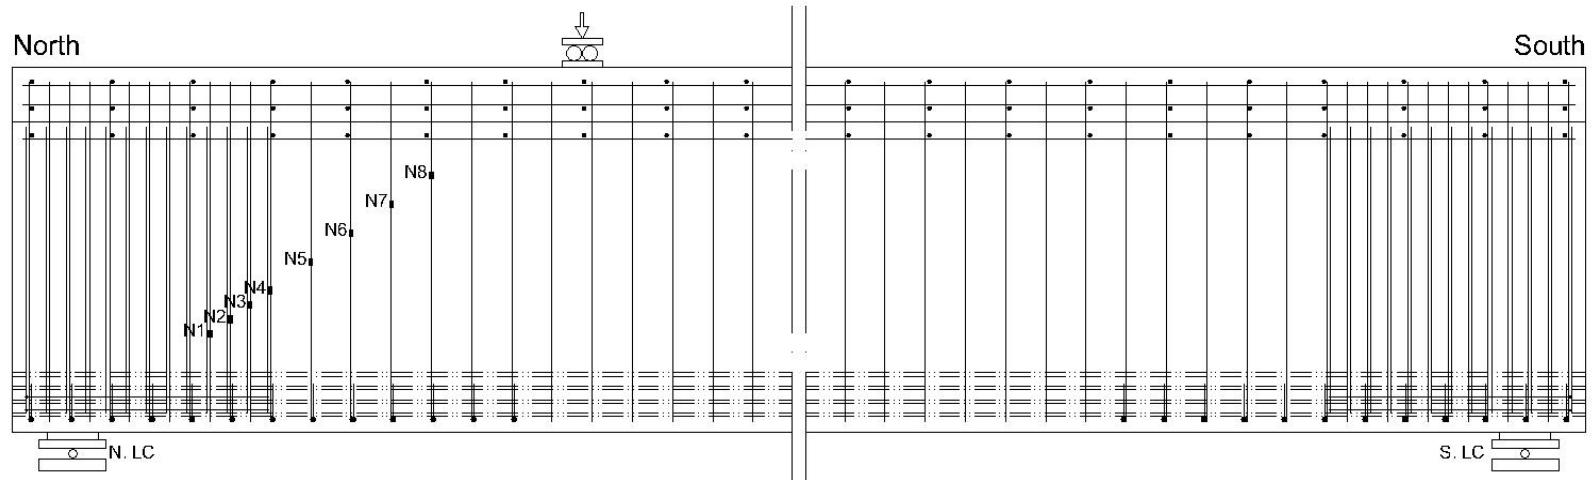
West View- Layout of Strain Gauges on Transverse Reinforcement for Girder D1-North End Testing (Labib 2012)
